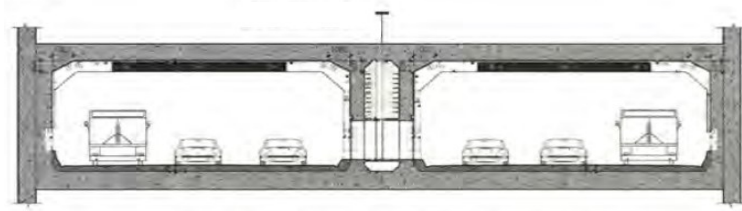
Cross section layout of Shanghai Yangtze River Tunnel (open cut section)
